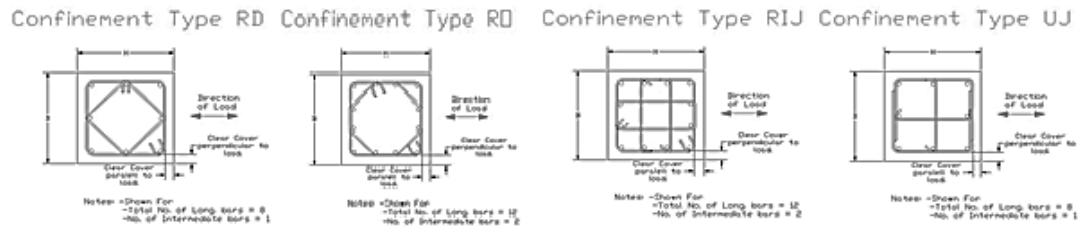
Detail of transverse reinforcement of cross sections.
